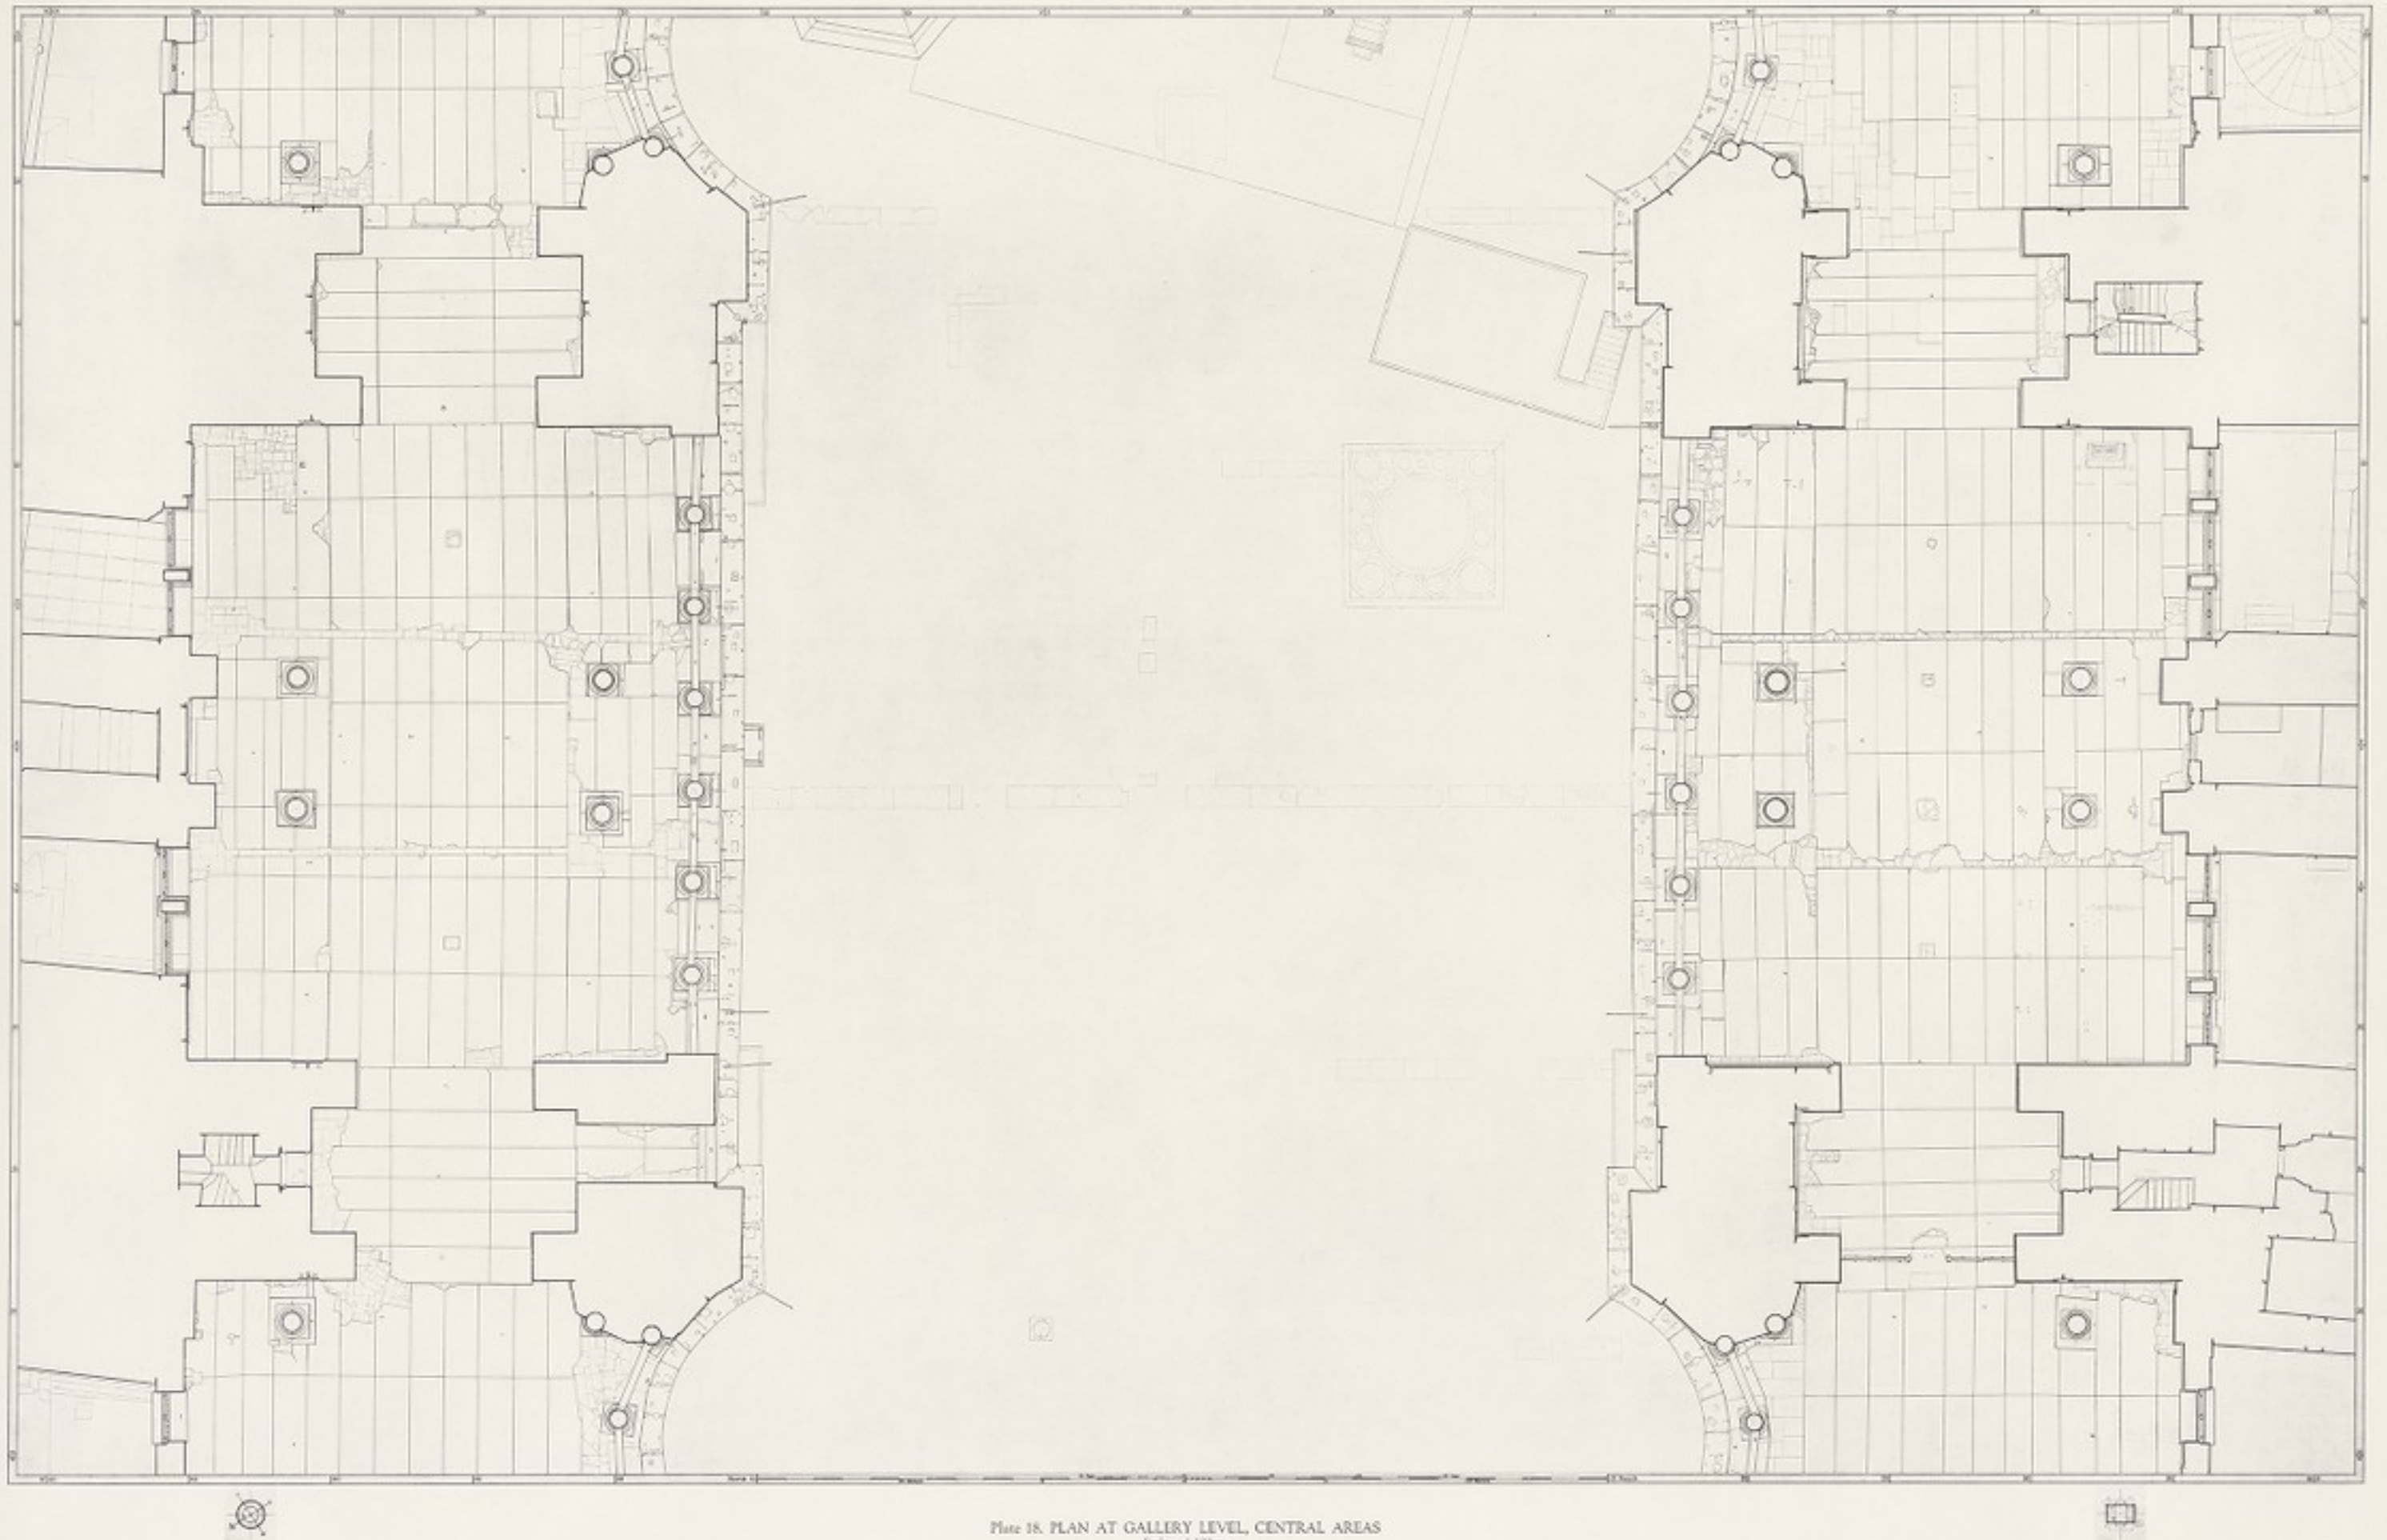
PLAN AT GALLERY LEVEL, CENTRAL AREAS
